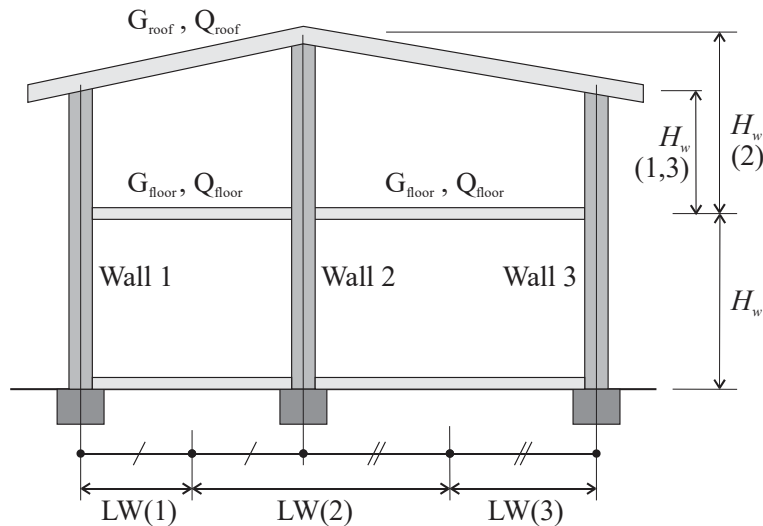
Overall building geometry, Two-storey ($n_s = 2$) double-bay building with internal and external walls, indicating the definition of wall height (H_w) and tributary width (denoted here as LW).
